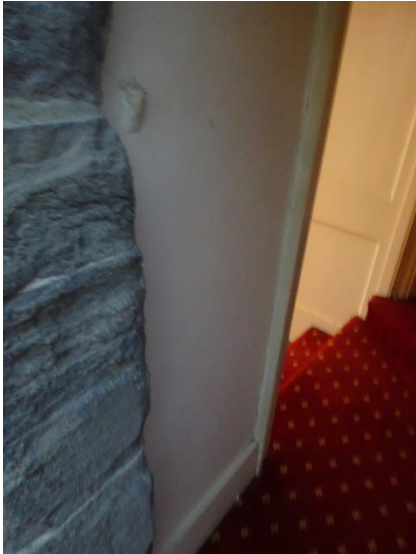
Medieval doorway S23-4, between chapel S23 and Northeast Tower, looking north
